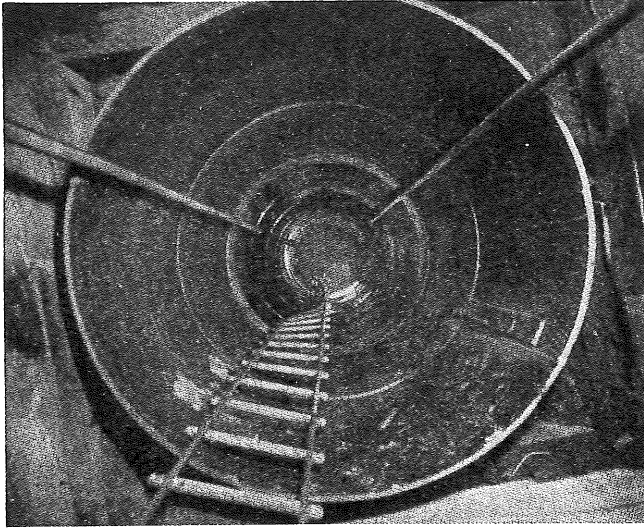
STEEL CYLINDERS USED FOR THE FOUNDATIONS OF THE MANHATTAN BUILDING, NEW YORK.
